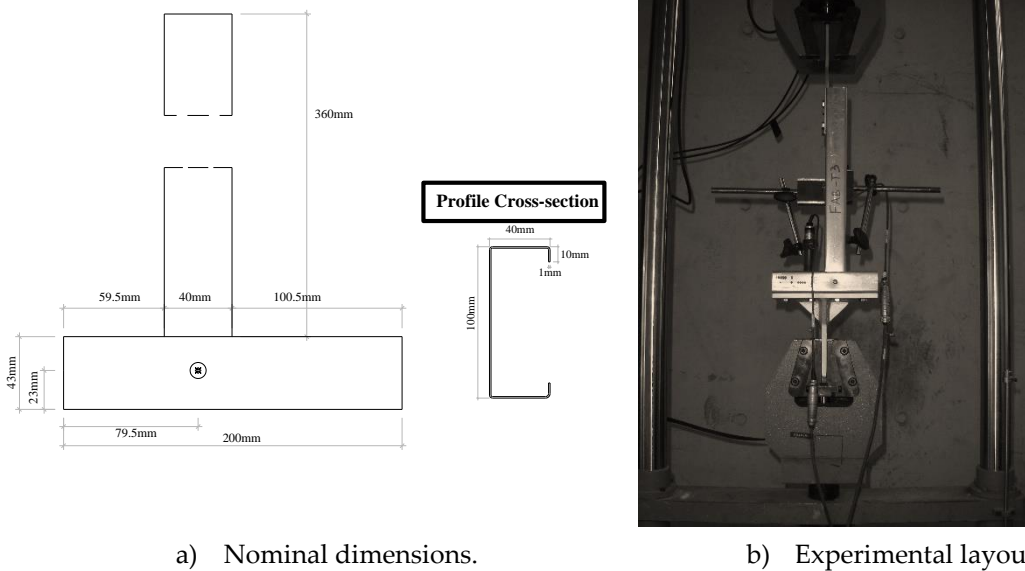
Screw connection test specimen's dimensions and experimental layout.
